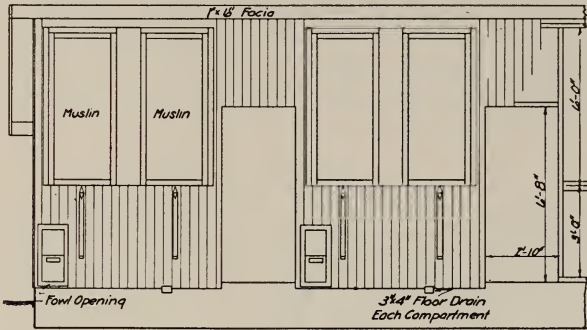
Front elevation of one 20-foot unit of brooder house.
